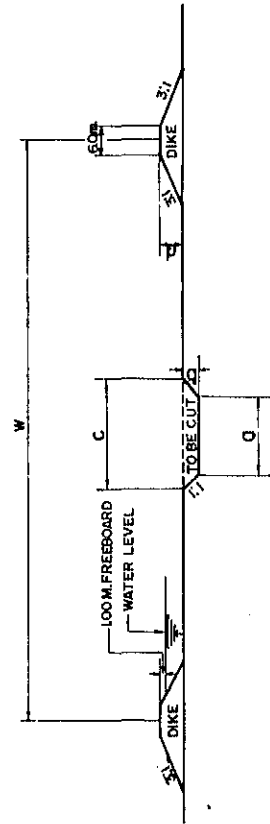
TYPICAL SECTION OF FLOODWAY
